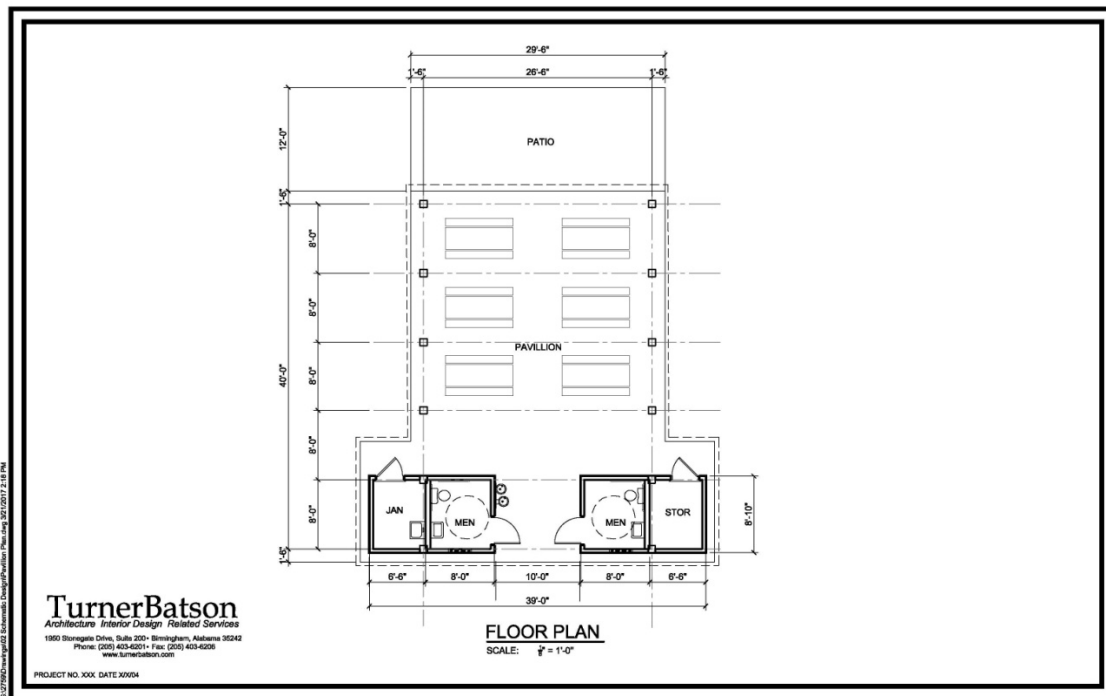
Plan of the proposed Shoal Creek Park pavilion (courtesy of the City of Montevallo).
